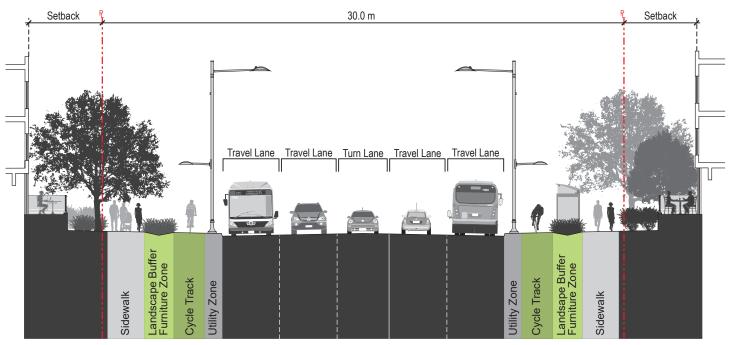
illustrates the recommended typical cross-section for Brimley Road. The preliminary cross-section for Brimley Road includes:
